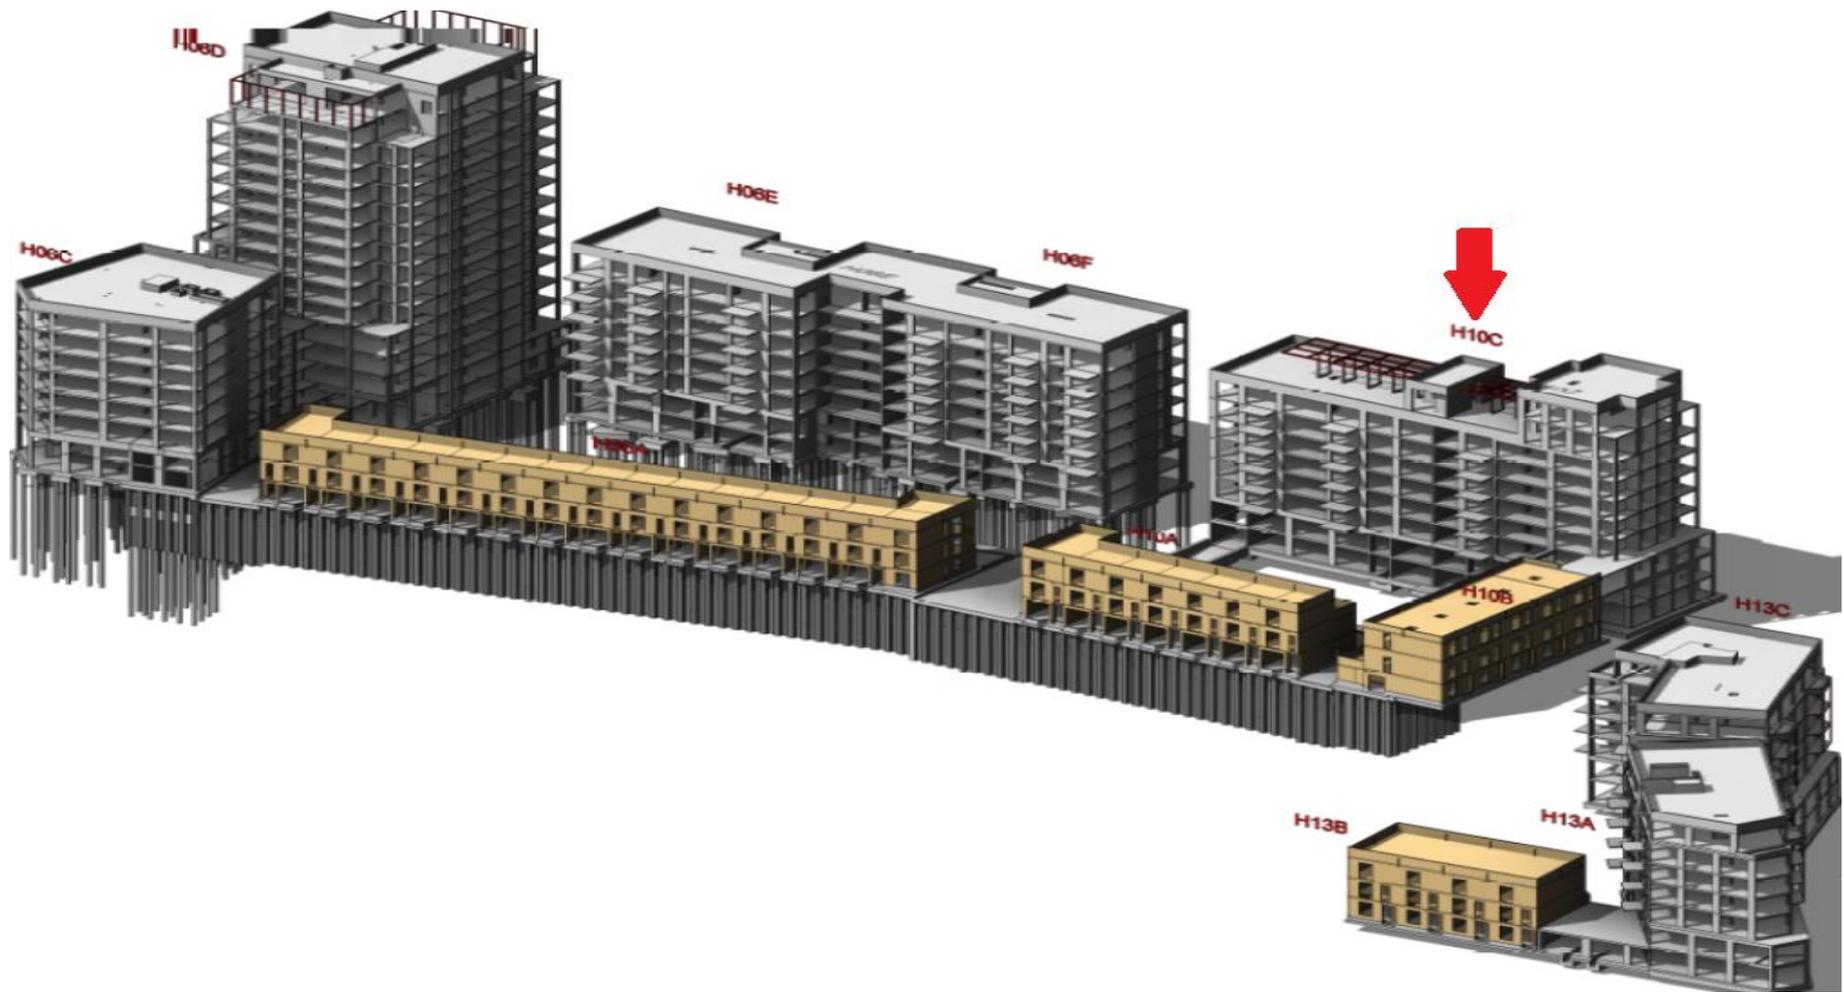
MP1 Site (Master Plan 1 – Elephant & Castle – London)
